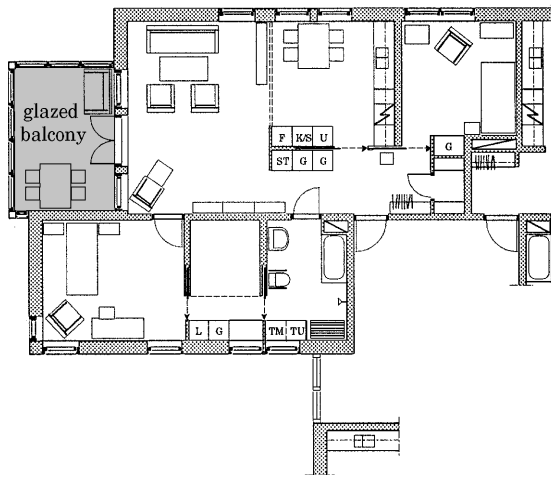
Plan of the studied flat (Wall, 1994a).
